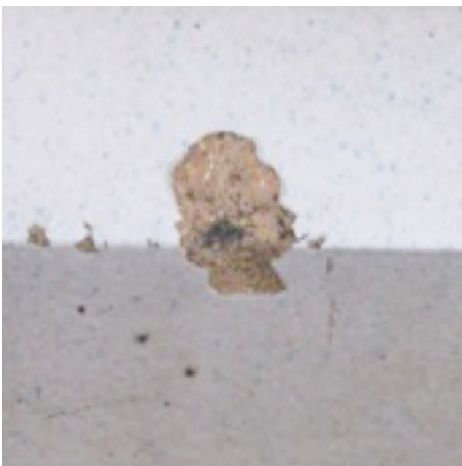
Glaze Spalling on Glazed Terra Cotta (Tiller 1979)
